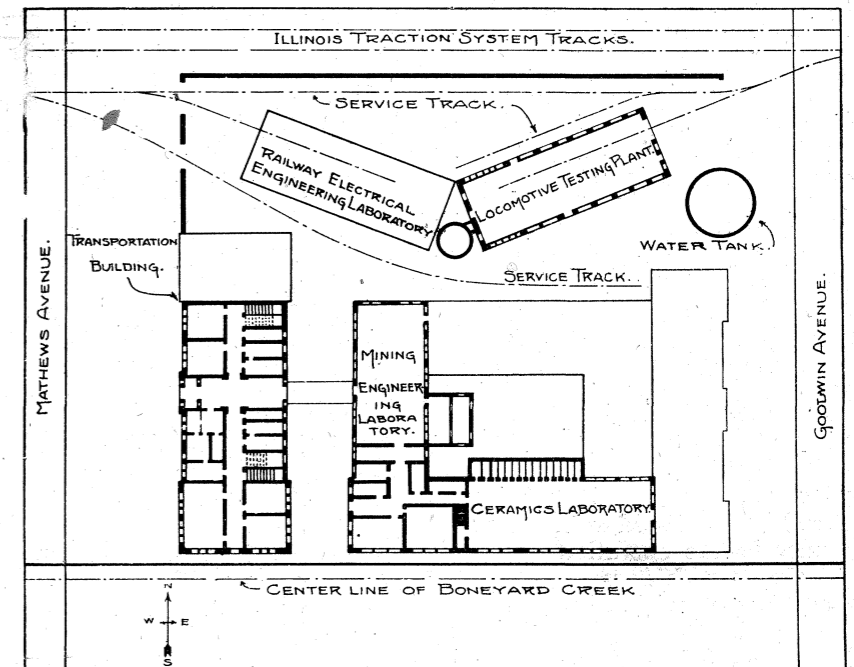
Group Plan of the New Buildings in the Transportation Group.
